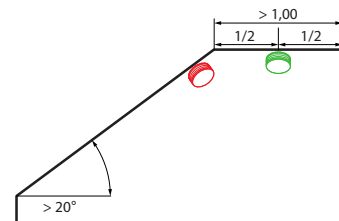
Straight mounting surface at least 1 m long and 1 m wide
